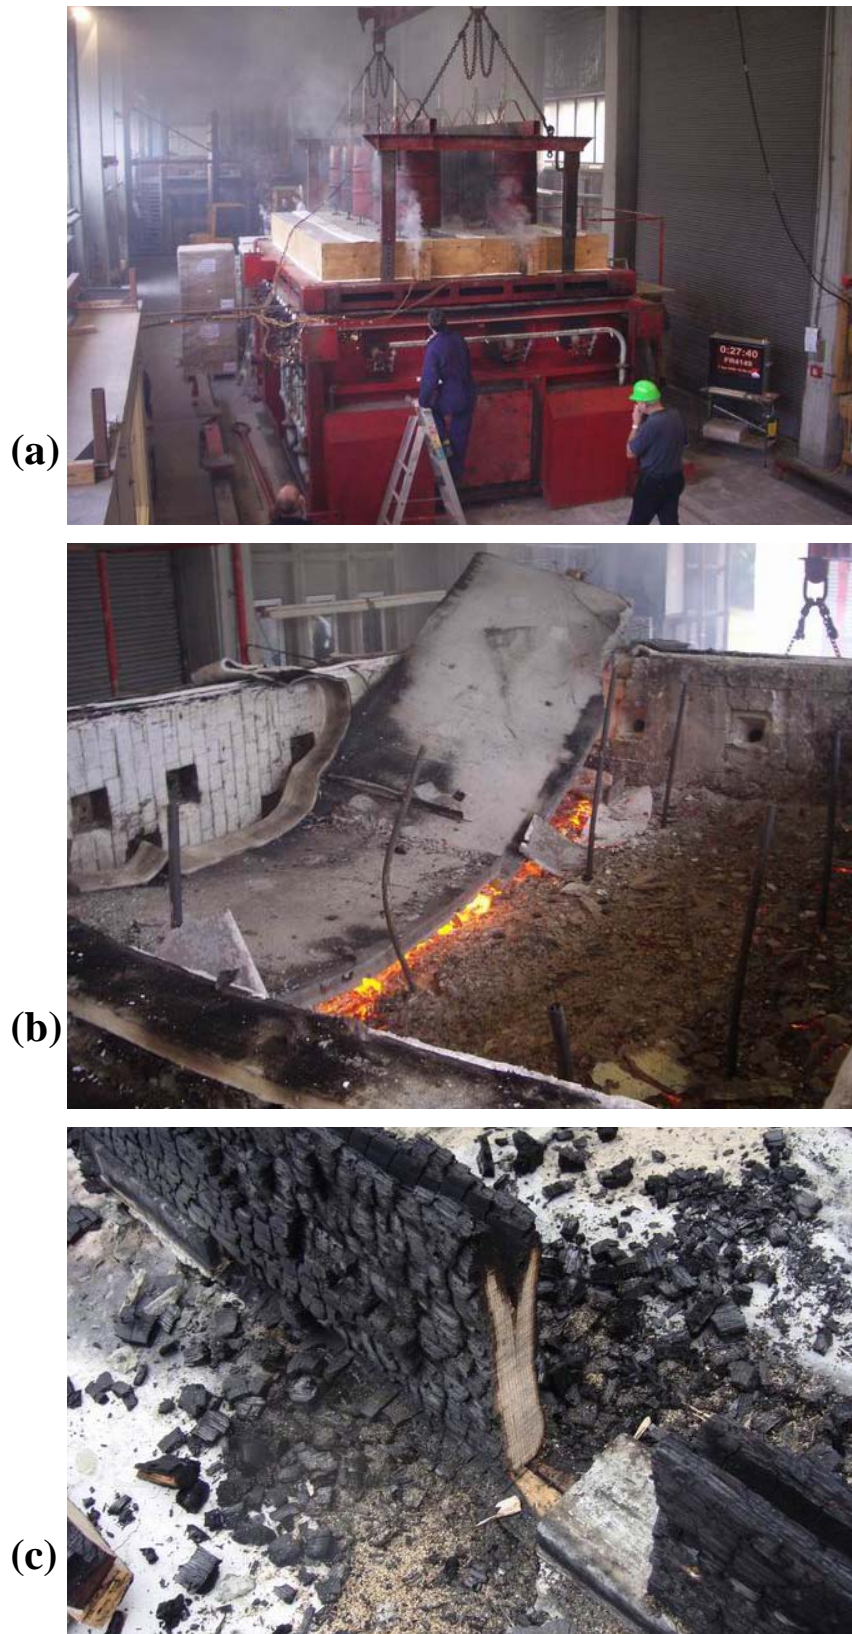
Full scale 4 m span TCC M-section floors: (a) Fire test in progress on floors loaded under service load; (b) 300 mm deep module with notched coach screw connection which collapsed after 75 minutes; and (c) Fire stopped after 60 minutes for 400 mm deep module with toothed metal plate connection to measure charring rate (O'Neill, 2009)
